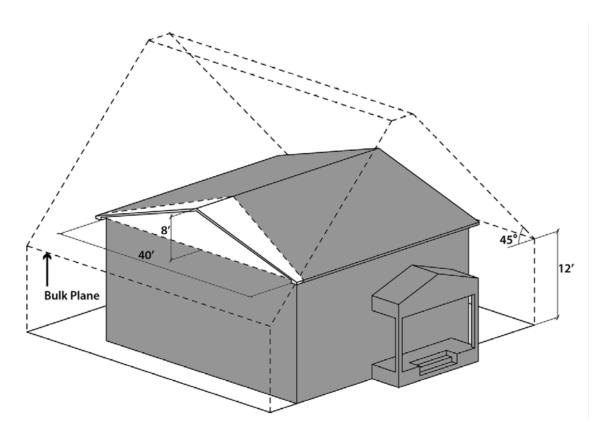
Gable Roof End Encroachment into the Side Yard Bulk Plane
